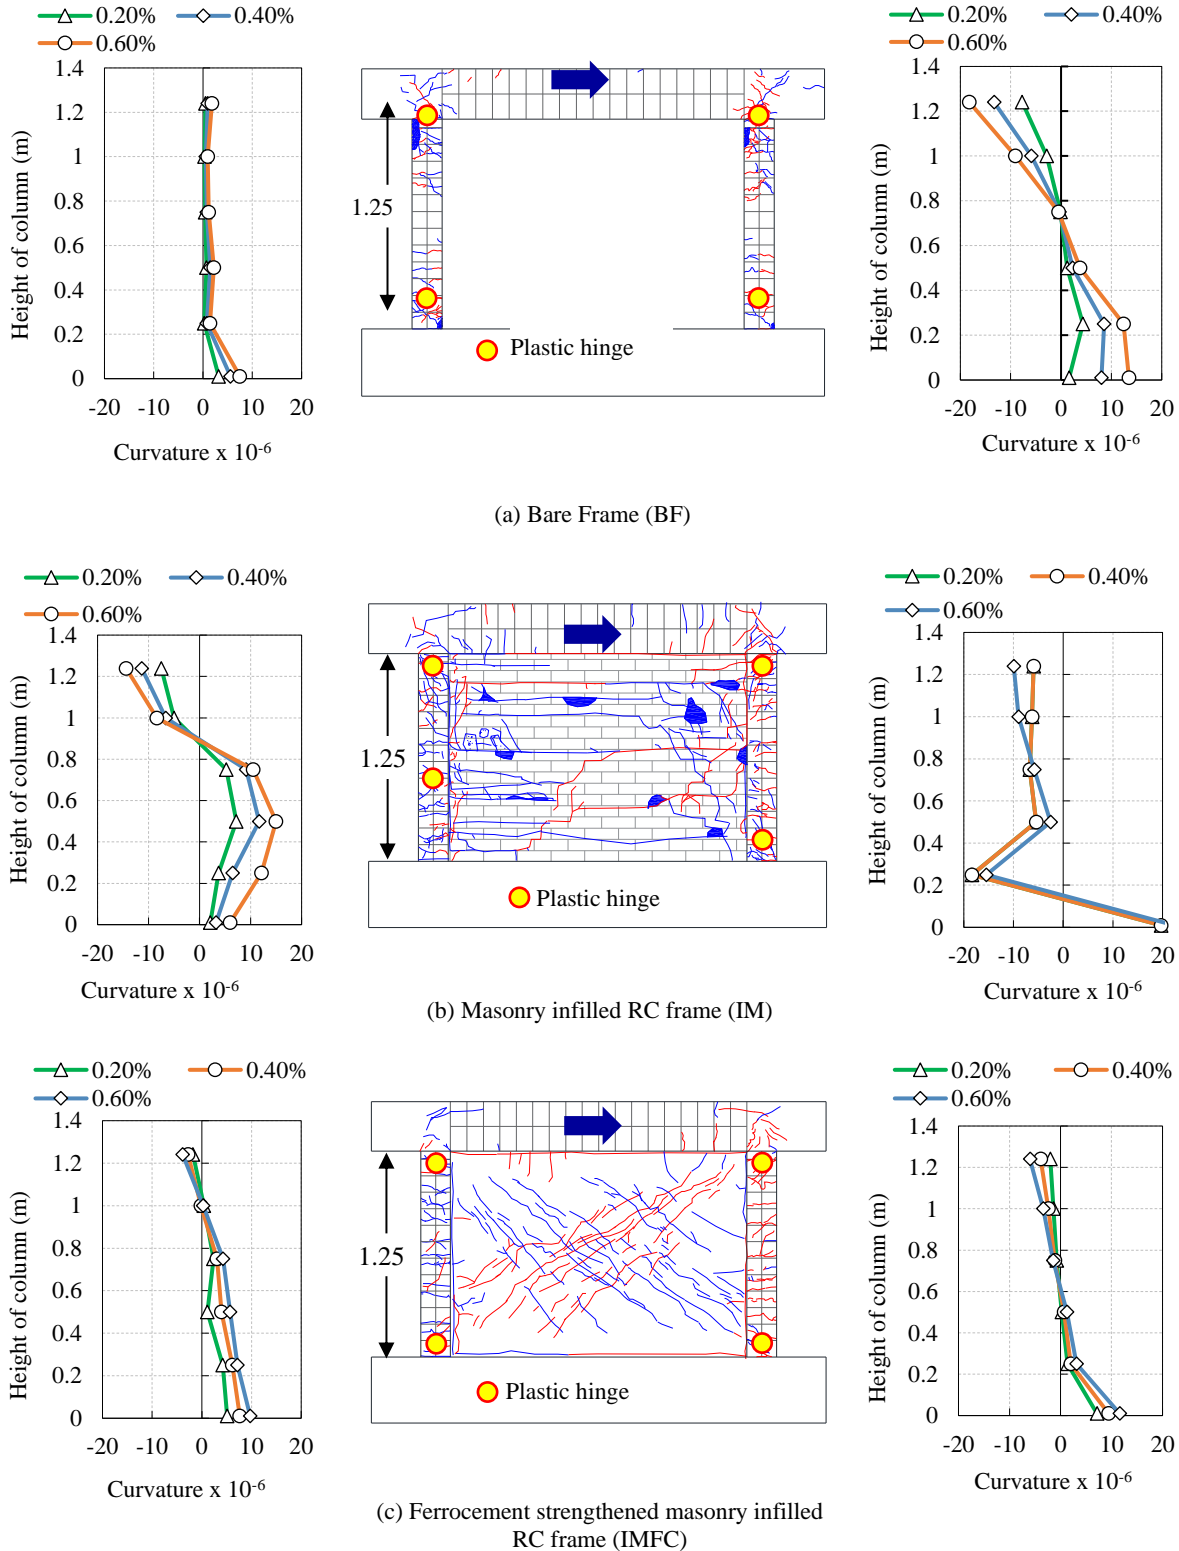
Curvature of tension and compression column and location of hinges of (a) Bare RC frame (BF), (b) Masonry infilled RC frame (IM), and (c) Ferrocement strengthened masonry infilled RC frame (IMFC) (clockwise rotation is positive).
